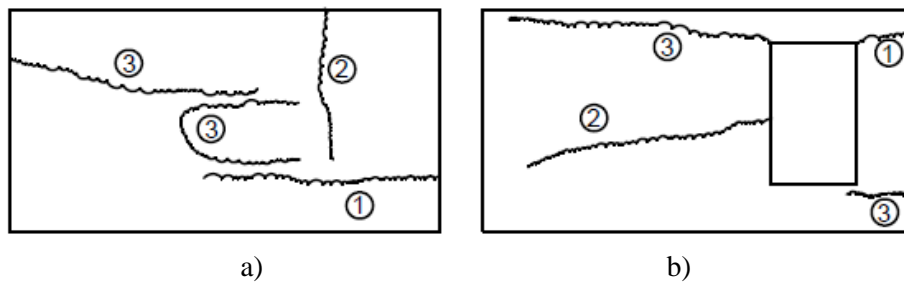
Sequence of cracking pattern of the: a) complete wall and b) wall with eccentric window opening
